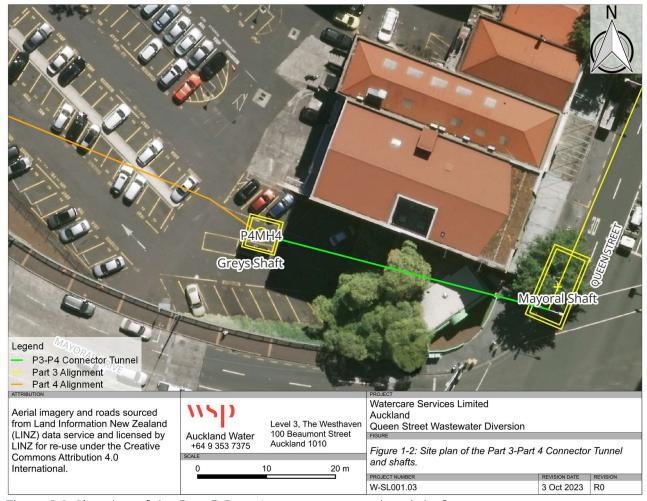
Site plan of the Part 3-Part 4 connector tunnel and shafts
